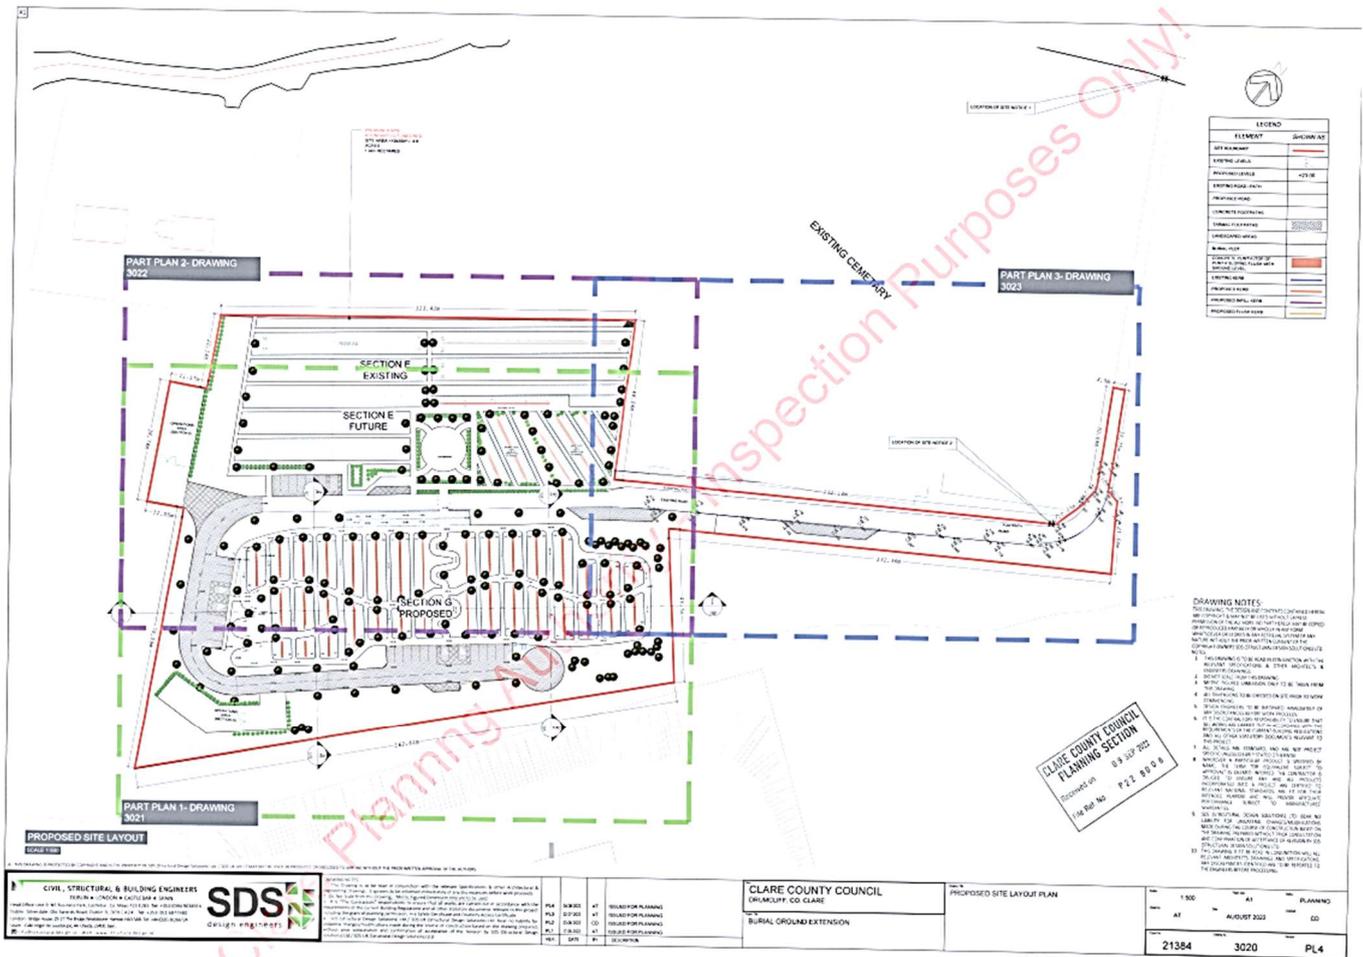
Proposed site layout of Drumcliff cemetery extension.
